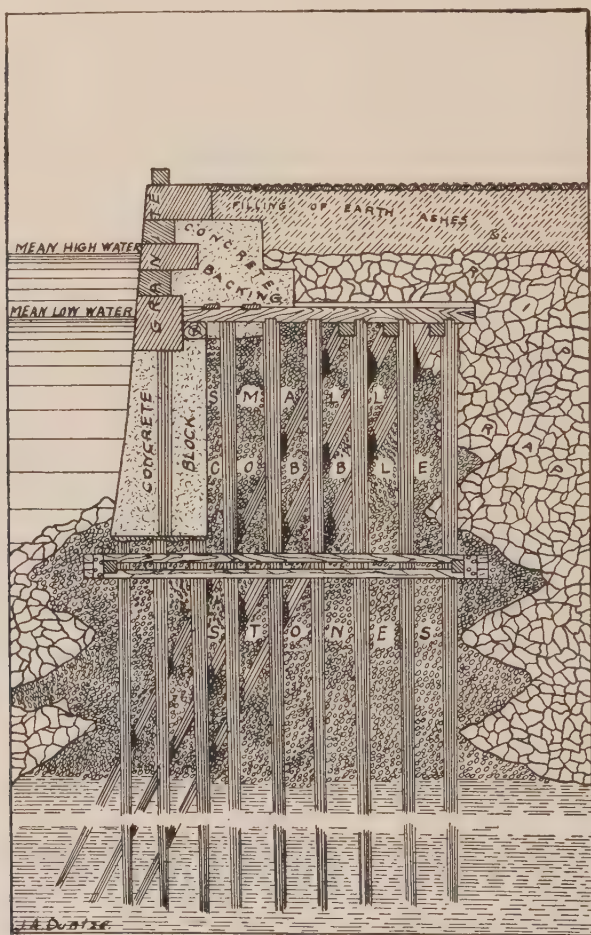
SECTION OF BULKHEAD WALL IN USE ON NORTH RIVER,
